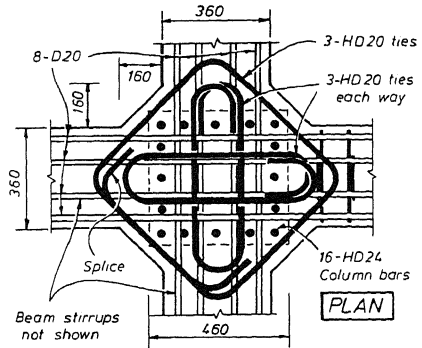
Joint Shear Reinforcement Formed Within Horizontal Beam Haunches.
